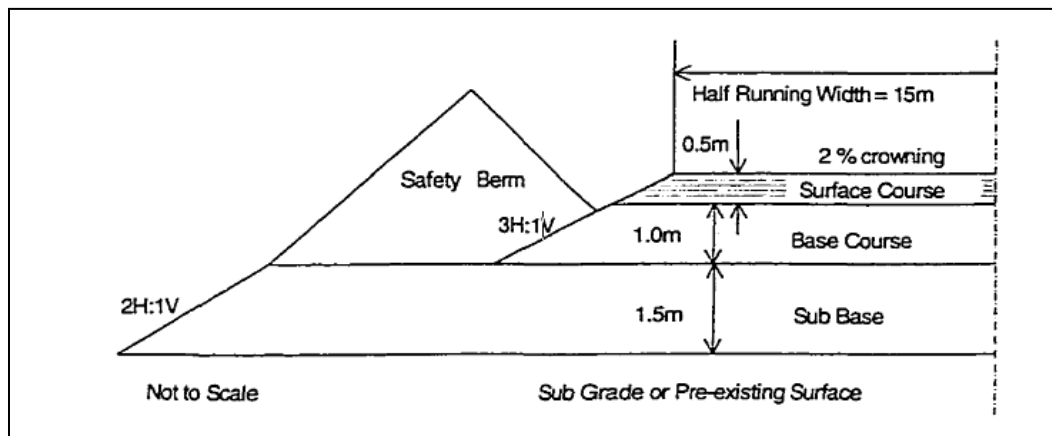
Typical Haul Road Cross Section (After Tannant and Regensburg, 2001)
